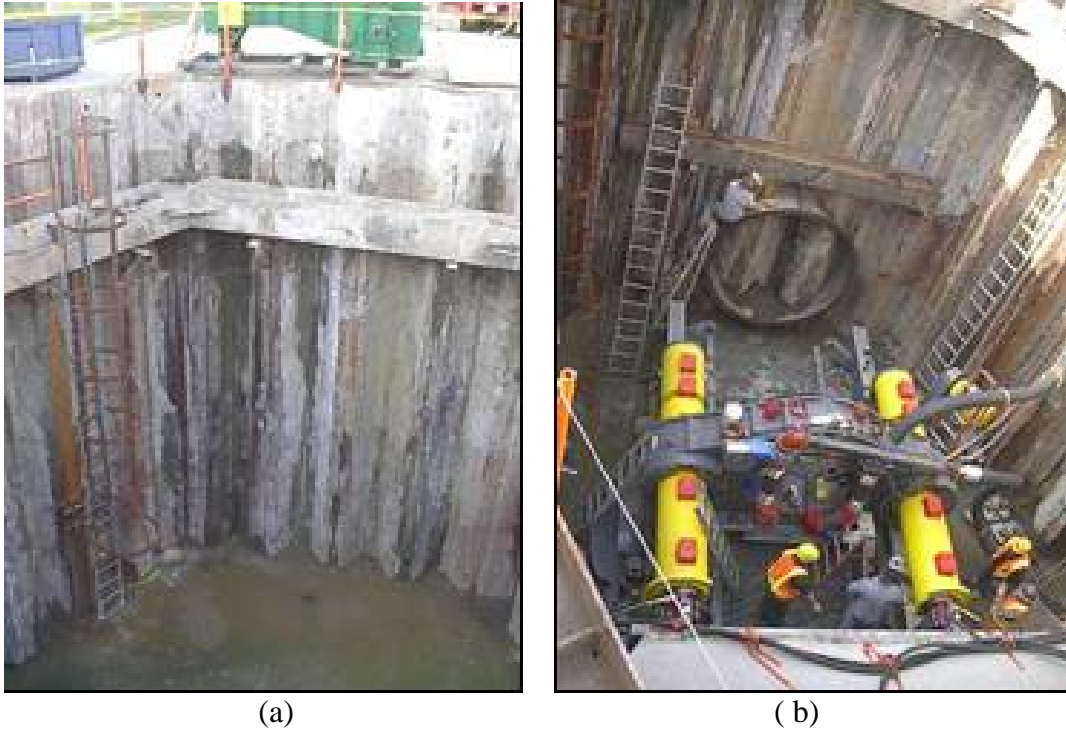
(a) Construction of the Sheet Pile Jacking Shaft Within the Jet Grouted Area (b) Completed Jacking Shaft with Jacking Frame (forefront) and mounting launch seal (background).
